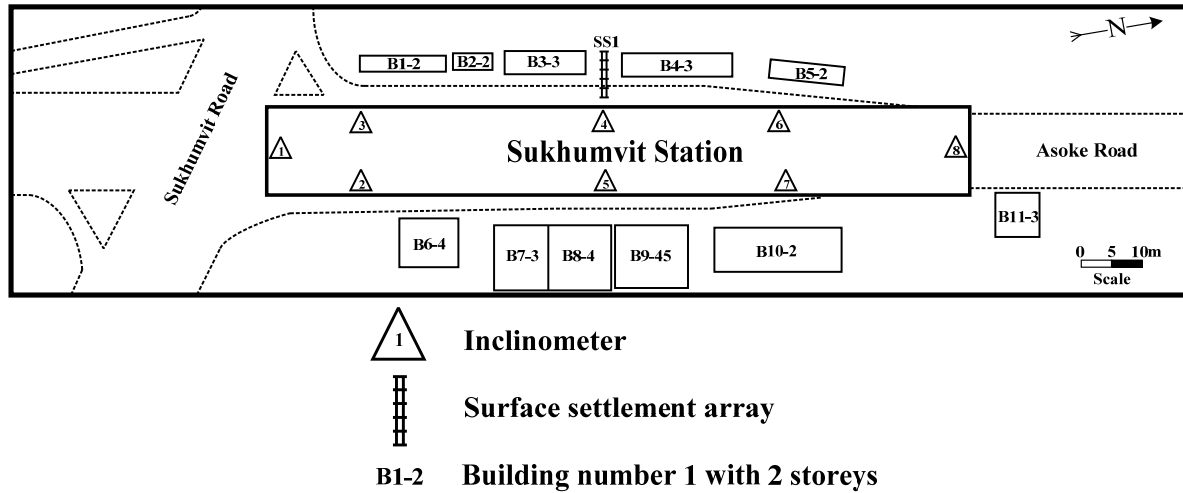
Plan View of Sukhumvit Station and Its Instrumentations
